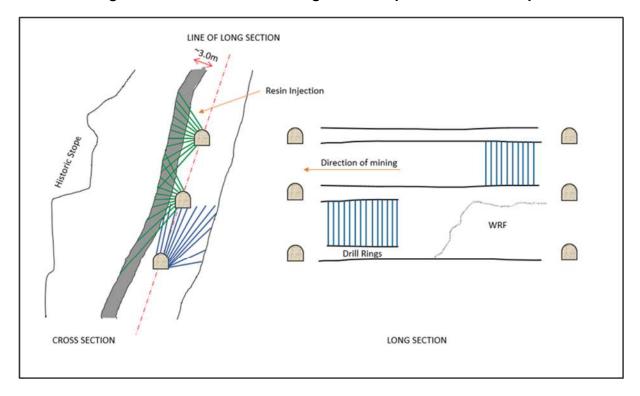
Modified Avoca against Collapsed Historical Stope
